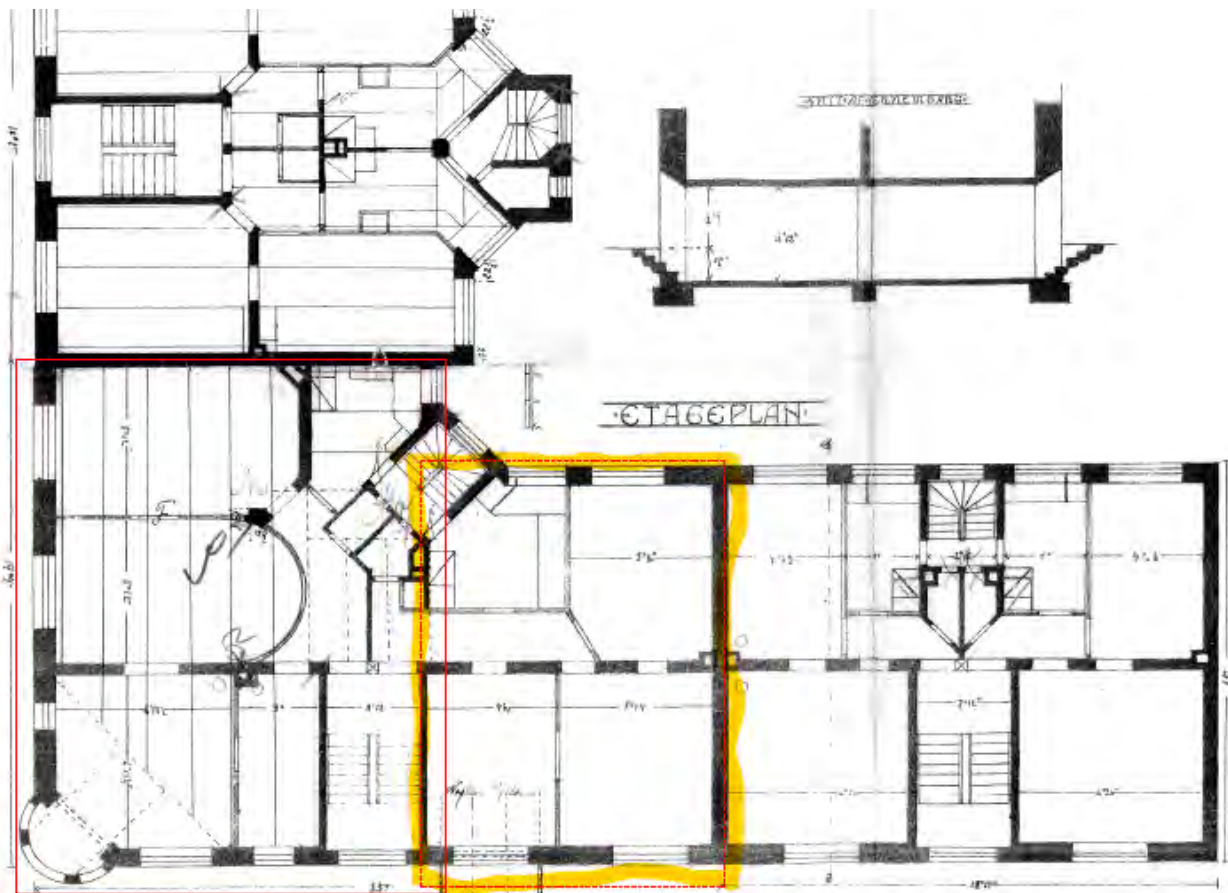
Floor-plan drawing of apartment at upper floor used as test case (yellow and red marking) for internal facade insulation
